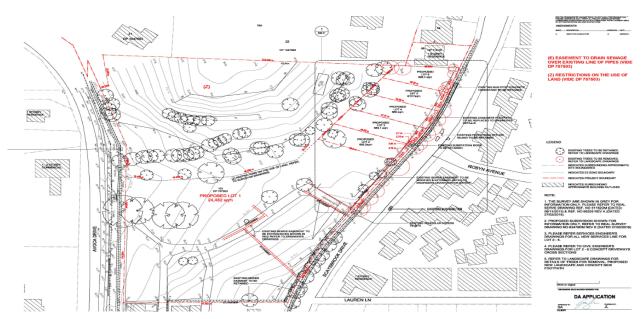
Development Application No.53417/2017 showing proposed subdivision of the site
